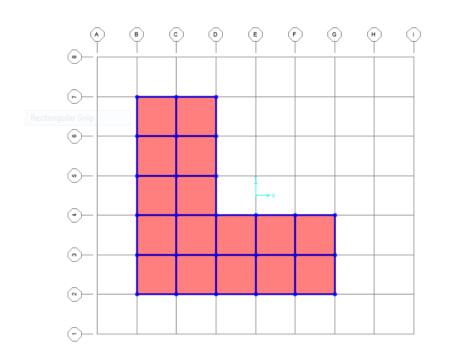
(b) plan of setback model 3(L-type) beyond 45m height
